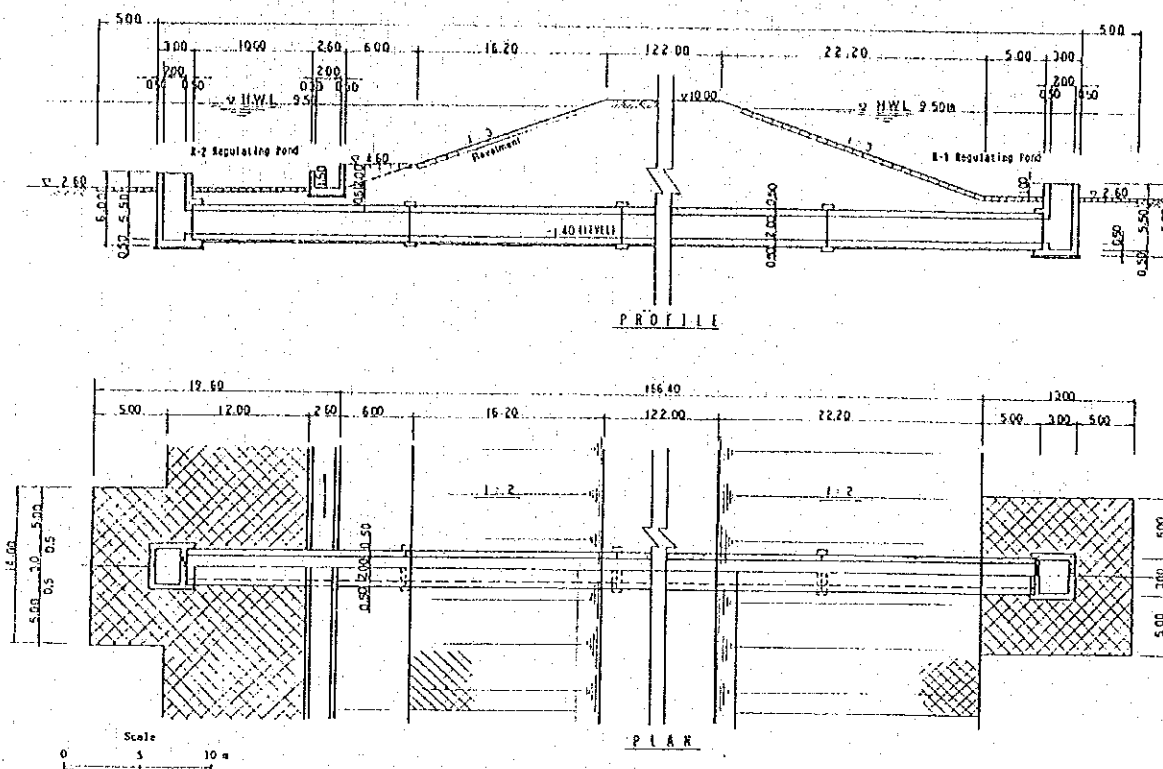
PROPOSED CONNECTING CULVERT BETWEEN R-1 AND R-2 REGULATING PONDS
